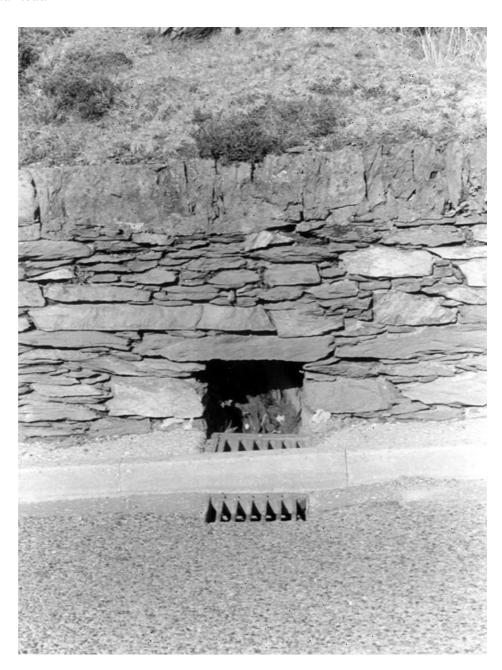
Drain from the road to the side ditch beyond the wall, Nant Ffrancon [847] (Ken Hoverd)
